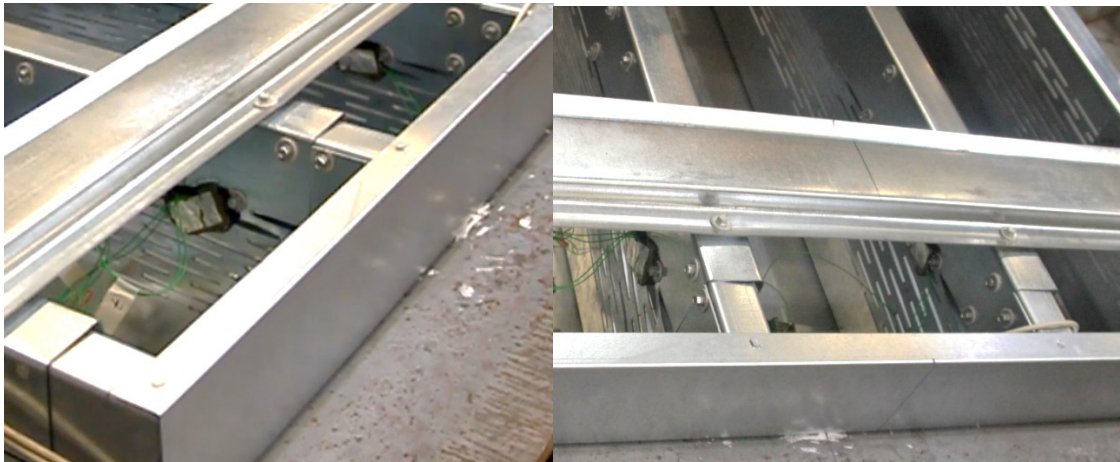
LTB over the full element span and distortional buckling half-waves between the hat profiles on test specimen 7.2M-B1 after failure.
